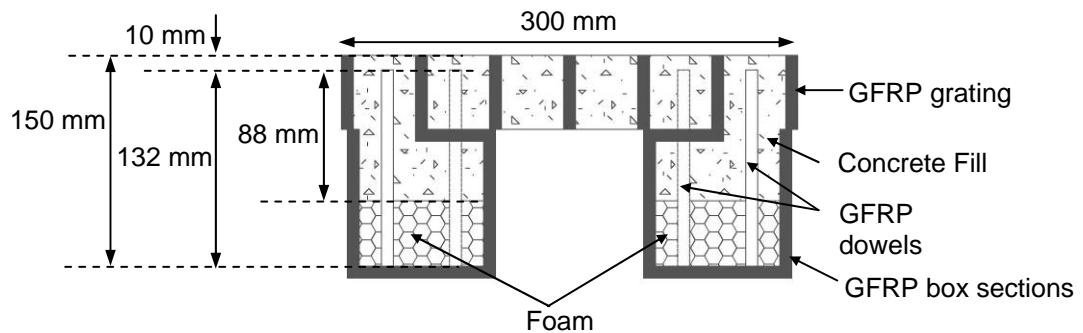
The cross section of the FRP-concrete hybrid formwork system
